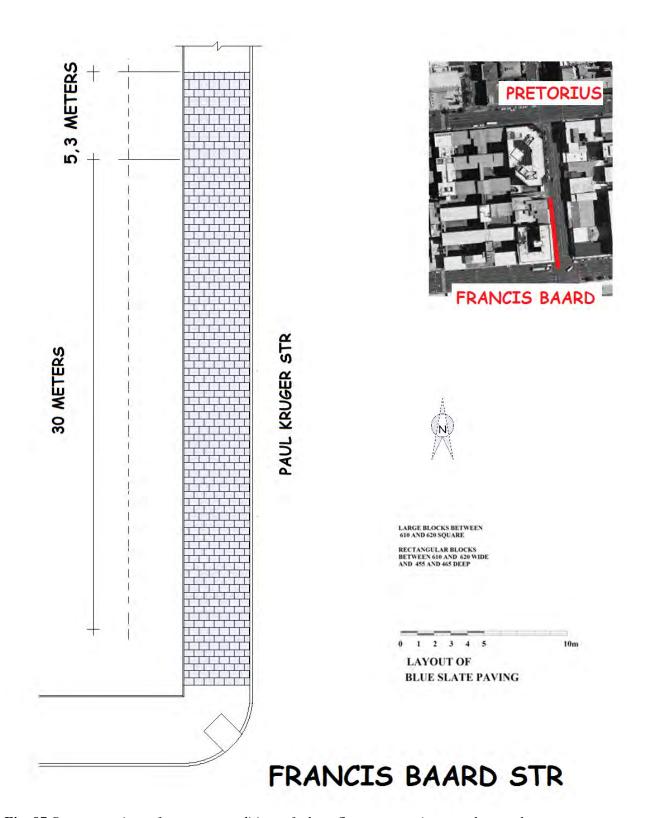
Reconstruction of present condition of slate flagstone paving on the southwestern side of Paul Kruger Street in Block 5. Although there appears to be around 120 square meters of slate flagstones intact their general condition is poor. Many have been lost through the installation of services.
